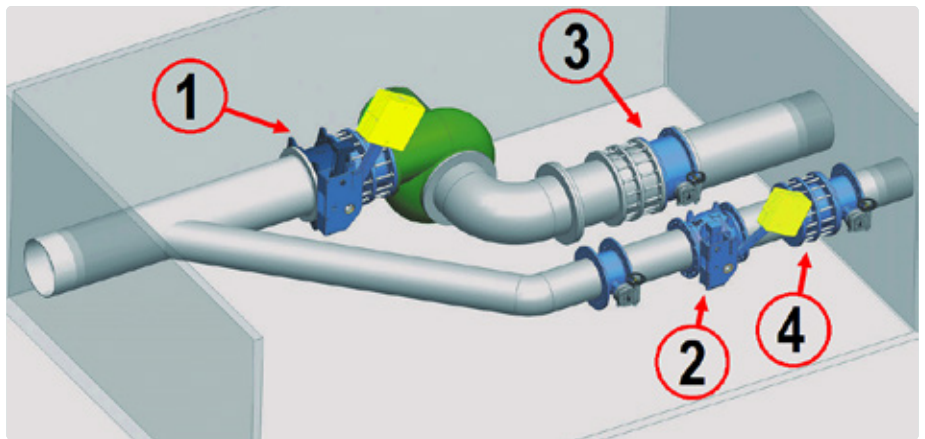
An example of turbine pipeline and bleed bypass fixture with T.I.S. fittings: 1. Butterfly valve (throttle) with a hydraulic cylinder and counterweight, 2. Needle valve with hydraulic cylinder and counterweight, 3. Shut-off throttle (renovation closure), 4. Mounting insert
